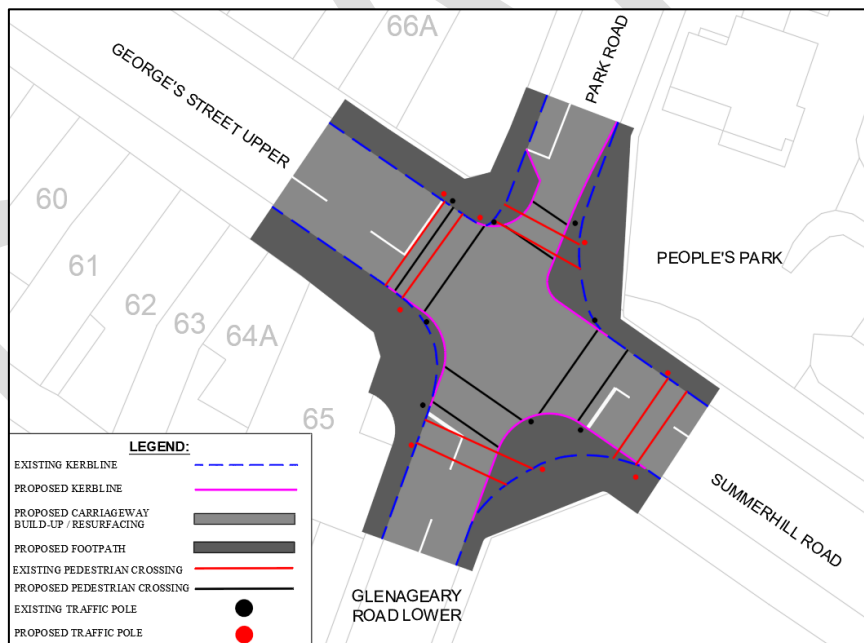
Proposed Layout at Glenageary Road Lower/George's Street Upper Junction
